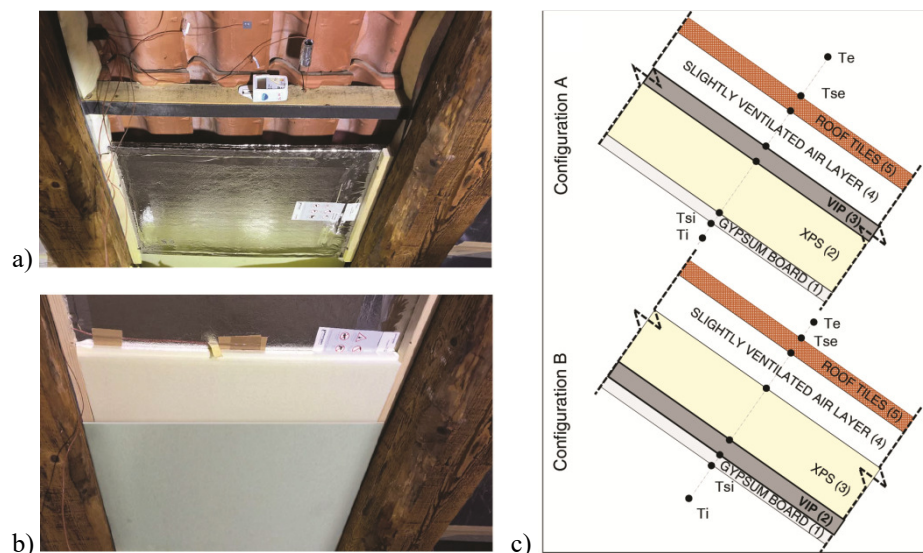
a) VIP in roof component; b) Roof insulation assembly; c) Roof sections (Configurations A and B)
